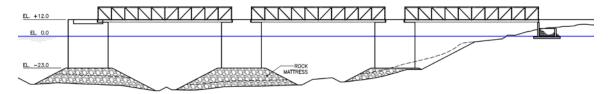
Elevation, Approach 1 for Steensby Island Ore Trestle (see Appendix A)
